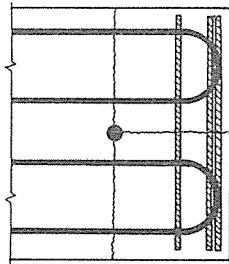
Horizontal section through the "beam" unit with presupposed splitting cracks around the bolt. The detailing is performed according to alternative "A" in Fig. 3.
